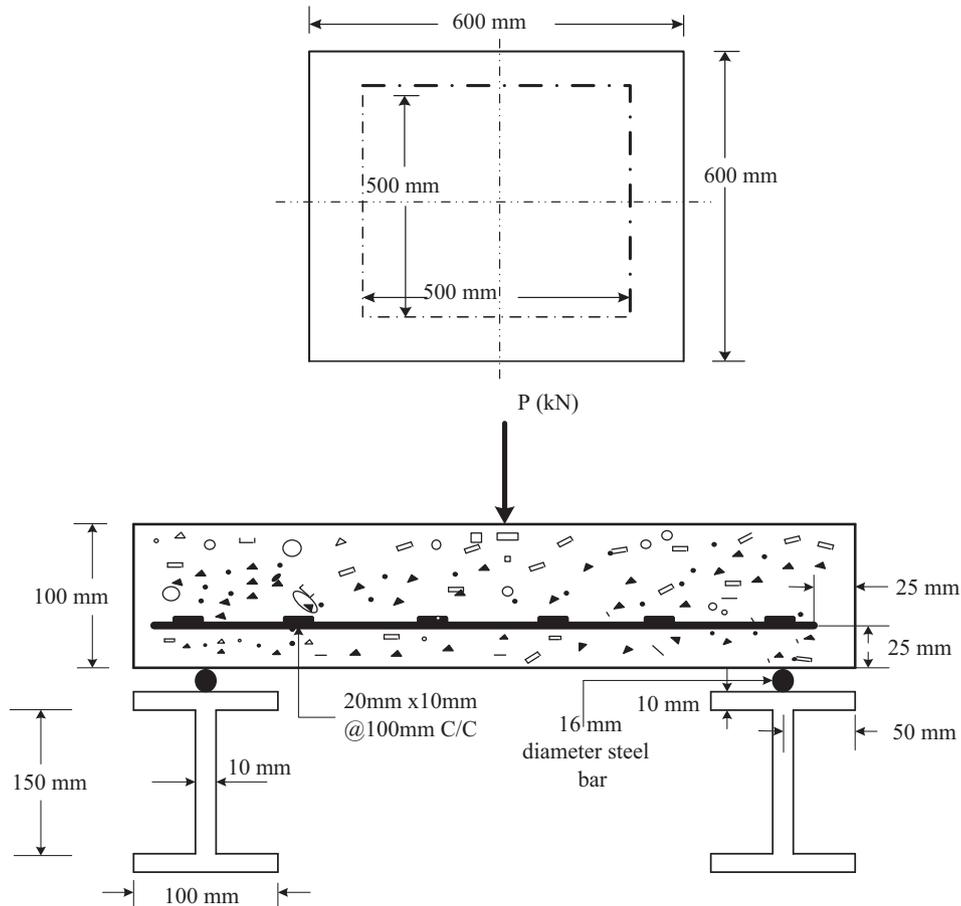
Schematic representation of slab panels and supporting frame used during test.
